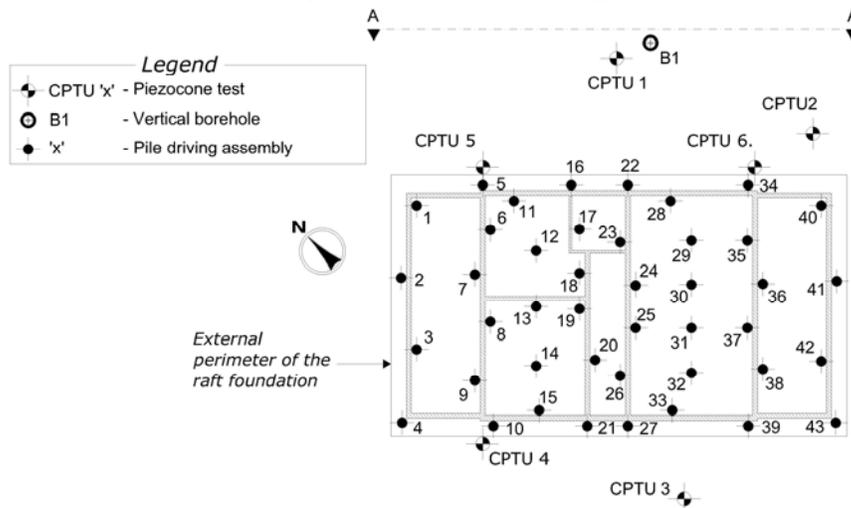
Plan of the building with piles lay-out and location of geotechnical investigations.
